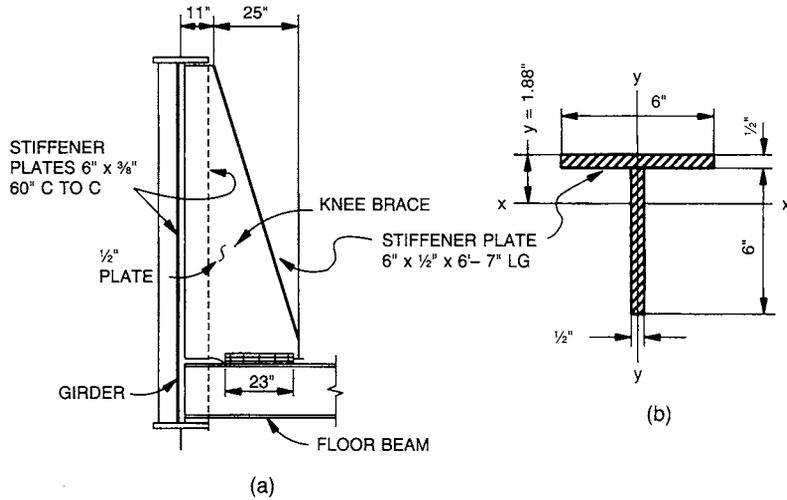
Knee brace for compression flange of through girder. (a) Elevation. (b) Cross section assumed effective.
